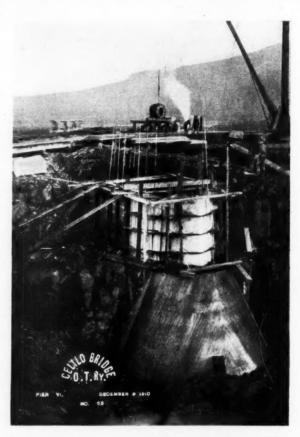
Pier VI, Showing Buttress Built Against the Side of the Ravine, to Support the Overhanging Nose Stones.
